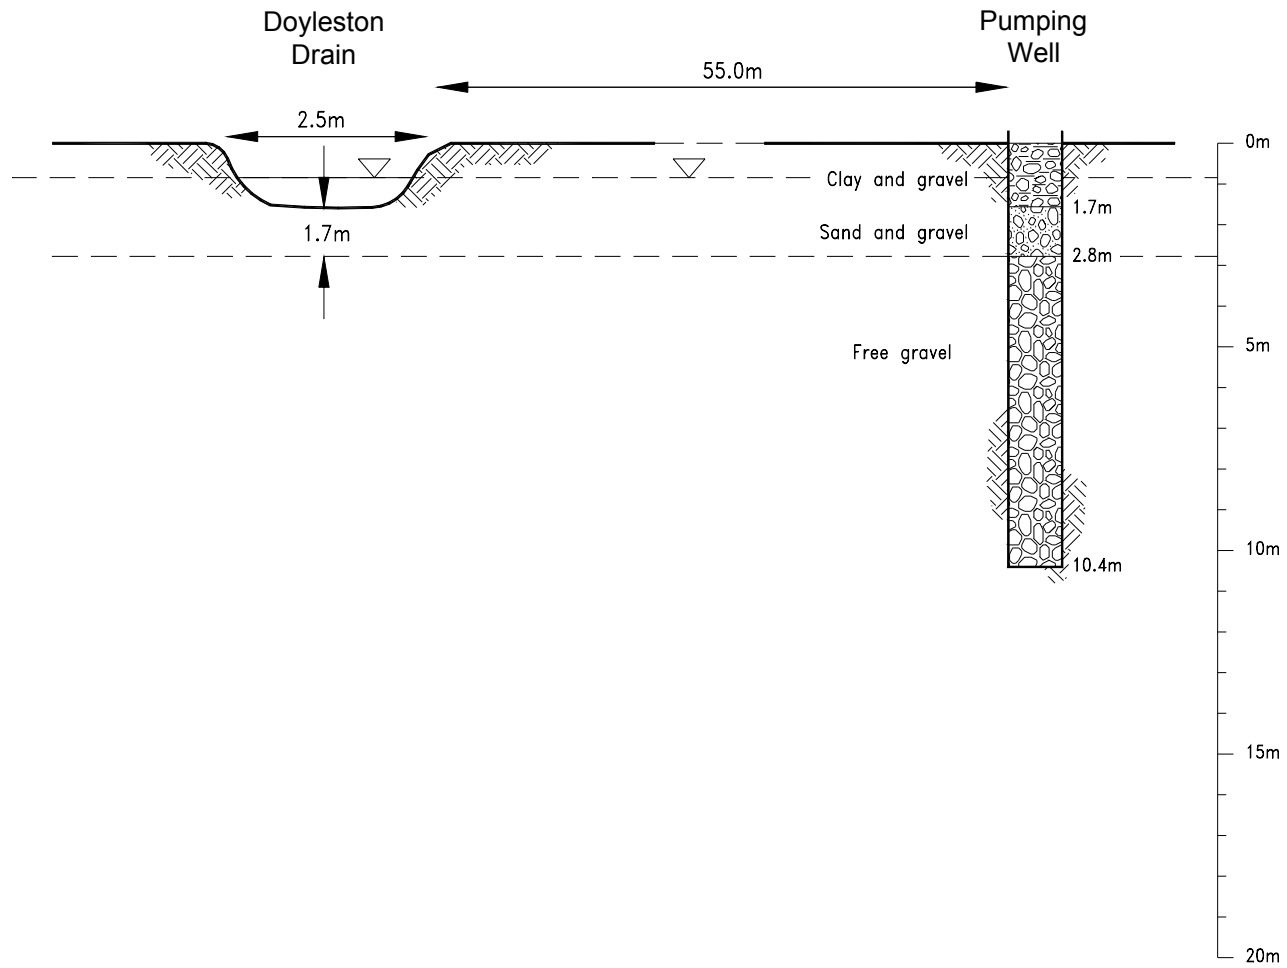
Conceptual Layout of Doyleston Drain Test Site
